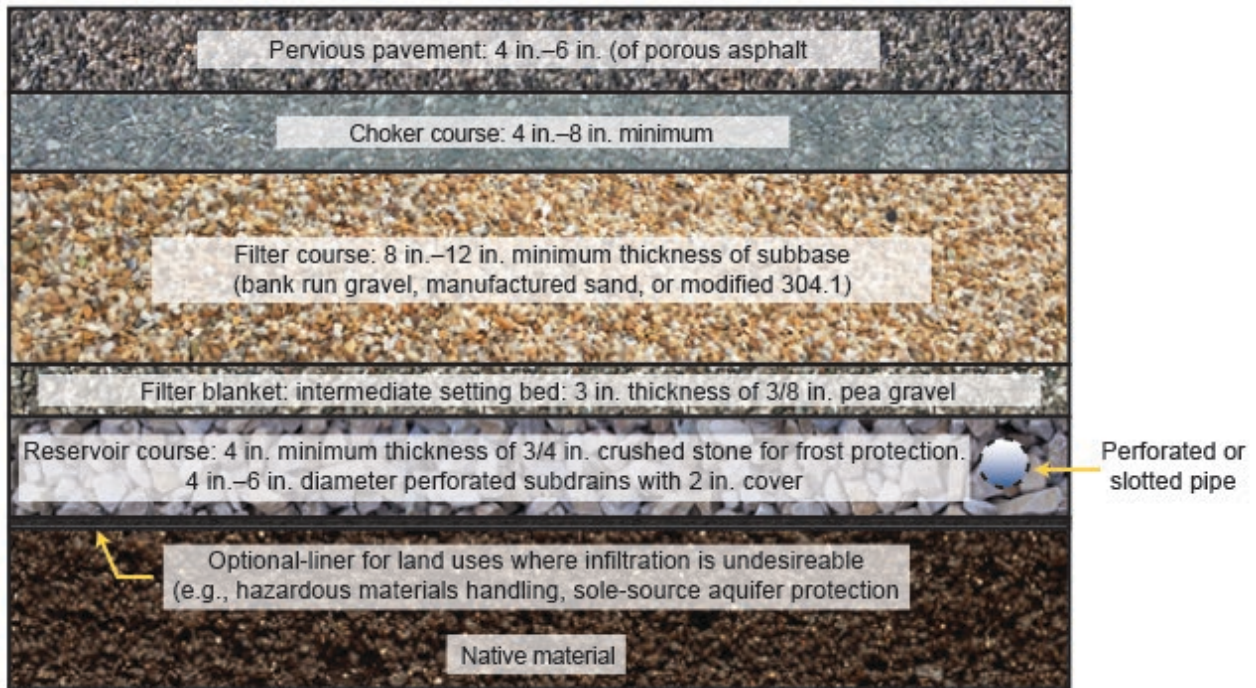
Typical cross section of a porous asphalt system (UNHSC 2009).
